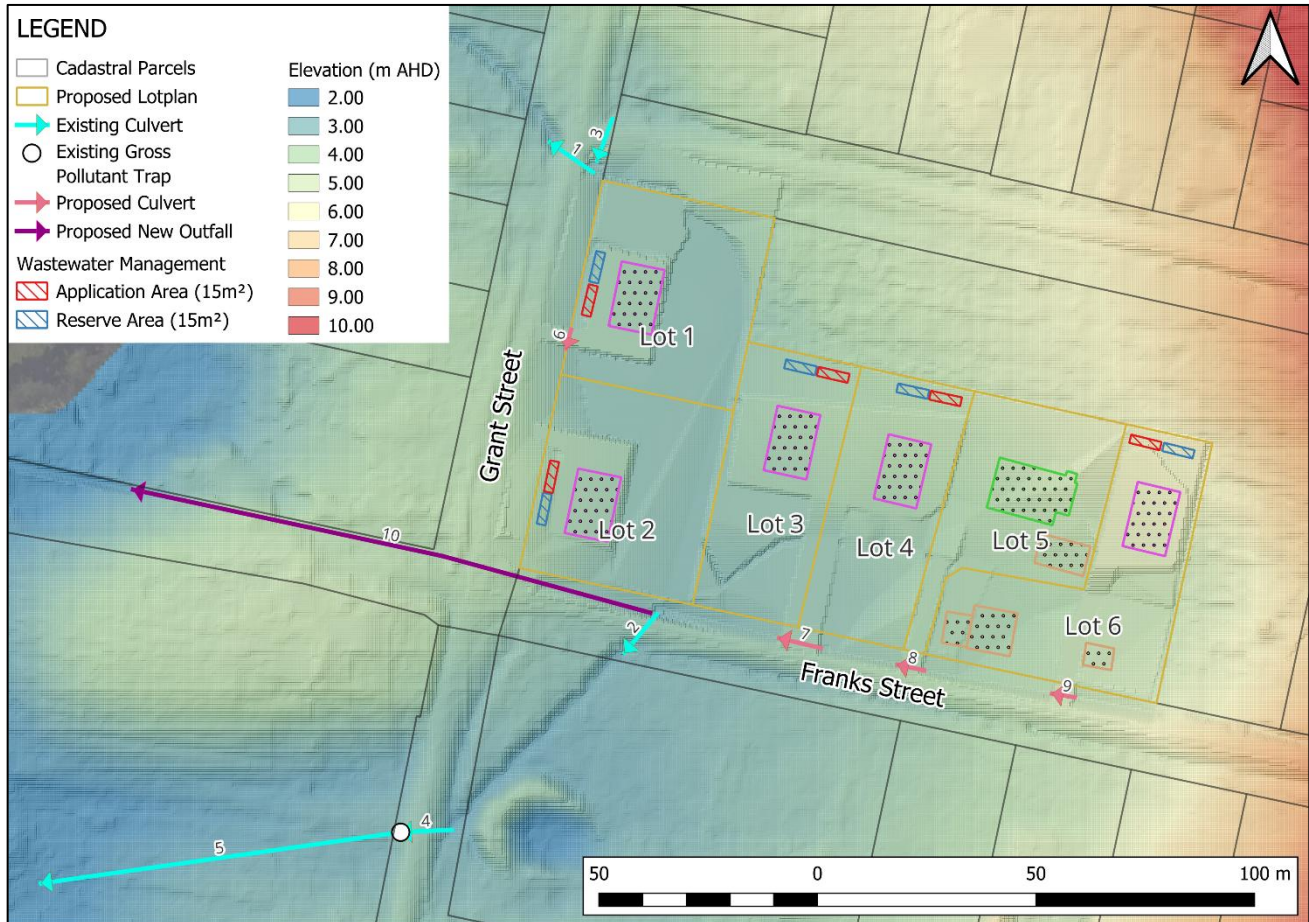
Site post-development topography and proposed lotplan with indicative building parcels and wastewater management.
